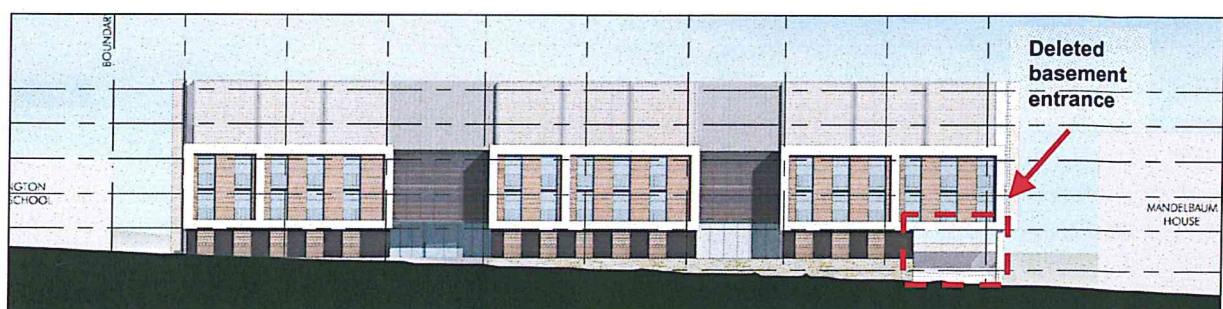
Approved Student Accommodation Building (Abercrombie Street Elevation)
